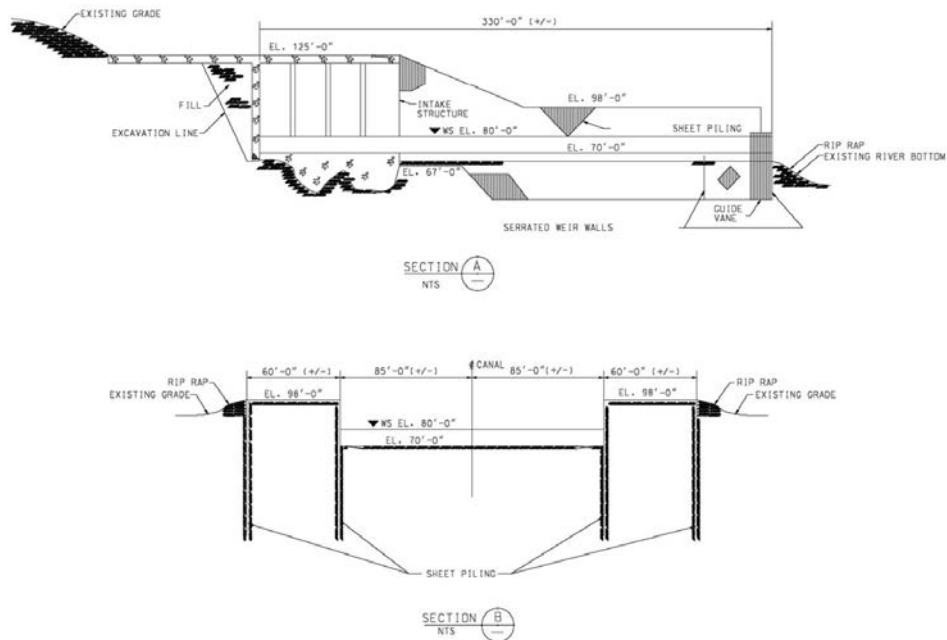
Section View of Proposed Cooling Water Intake Structure (Southern 2007a)
